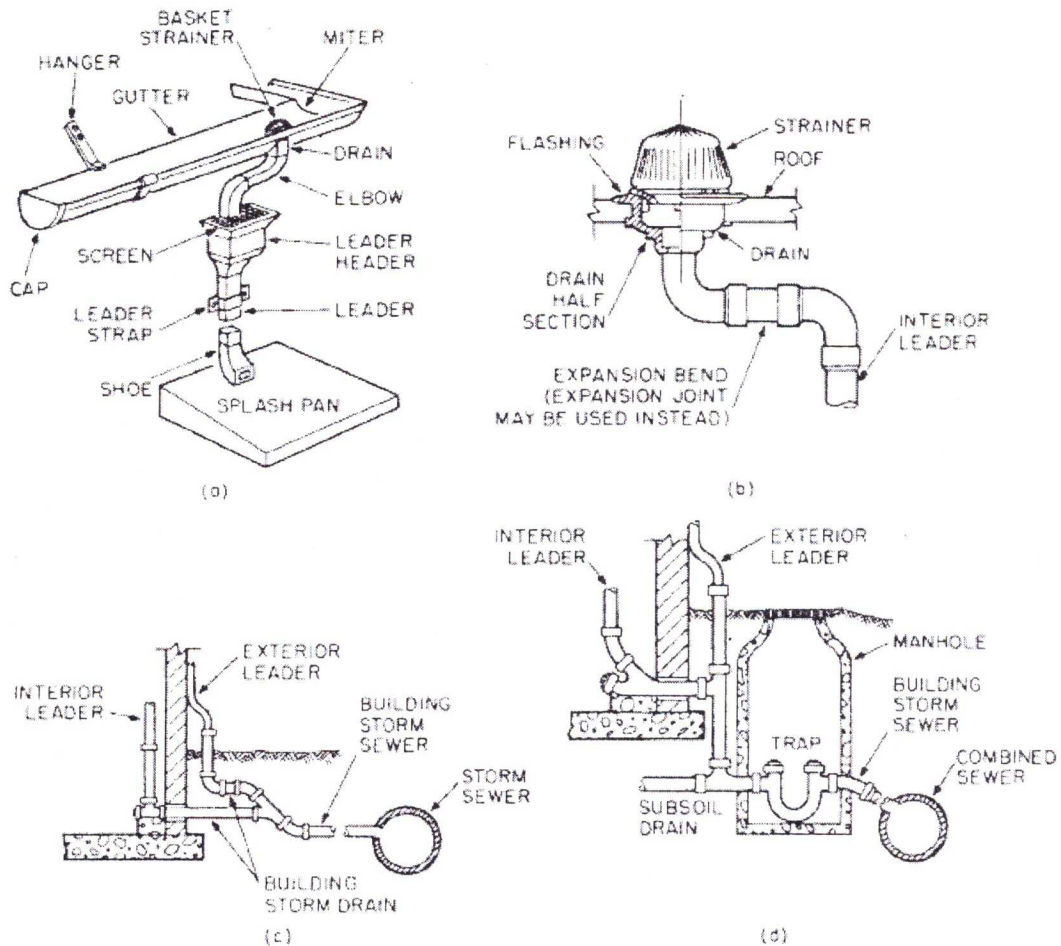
Elements of a storm-drainage system: (a) roof gutter, exterior leader, and splash pan; (b) roof drain and top portion of interior leader; (c) piping to a storm sewer; (d) piping to a combined sewer.
